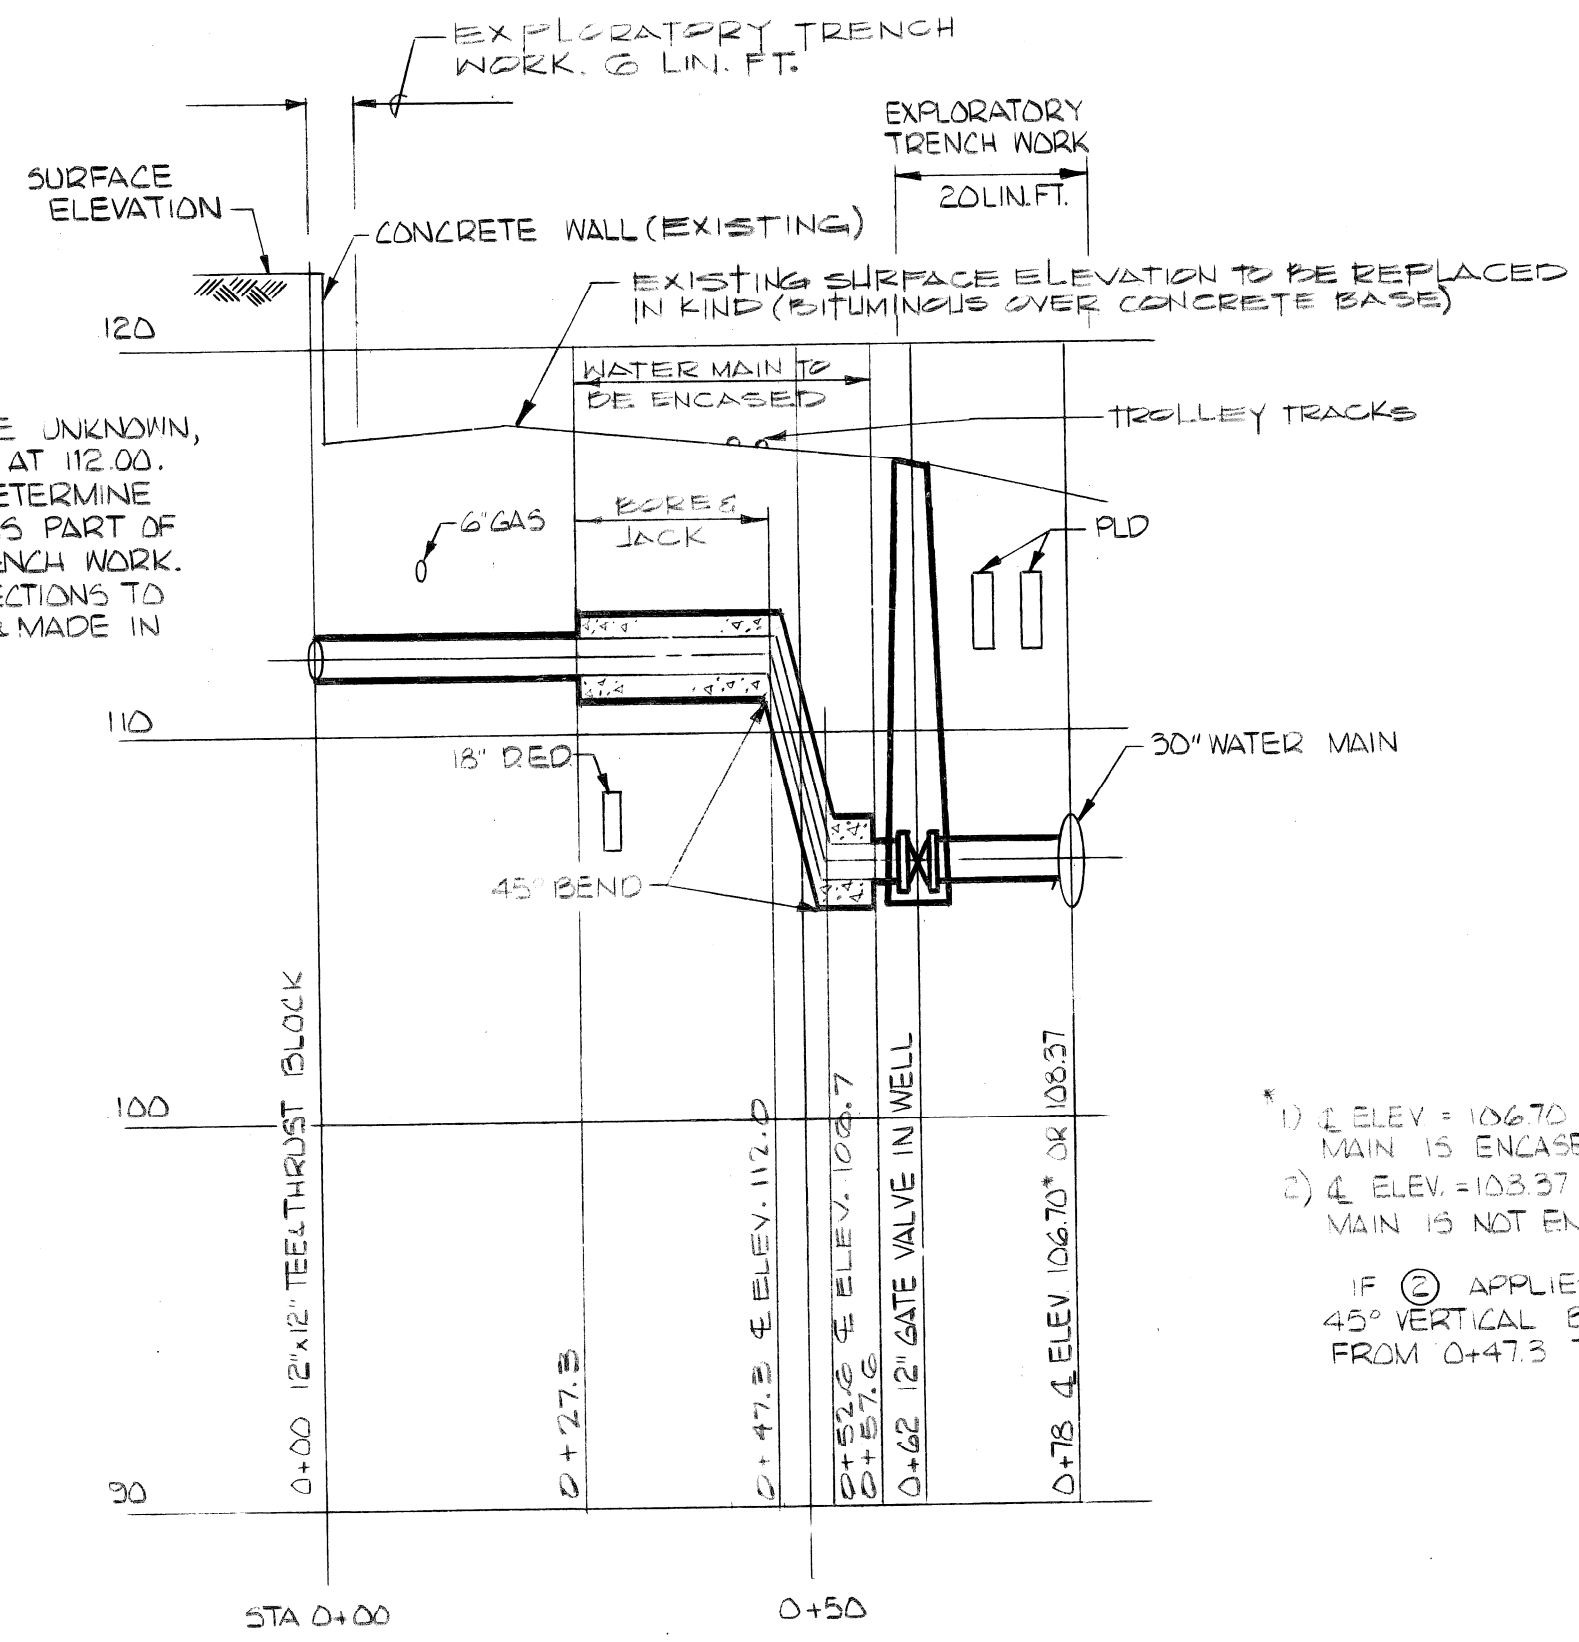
" WATER MAIN SERVICE CONNECTION
